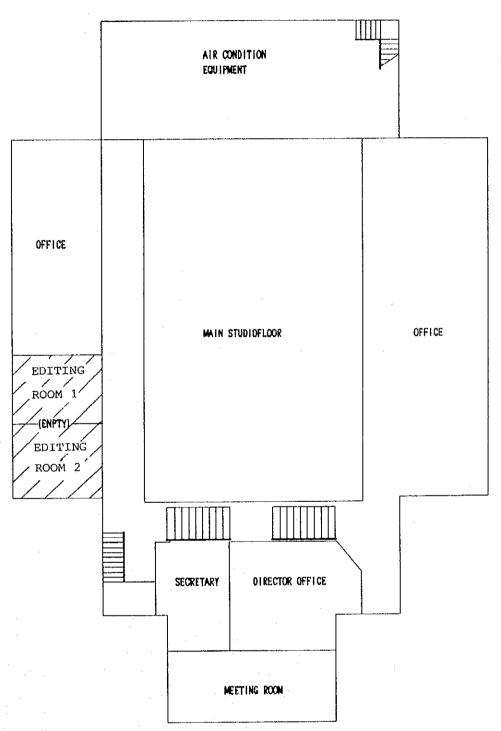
FLOOR LAYOUT OF KARUME HOUSE (1F)
